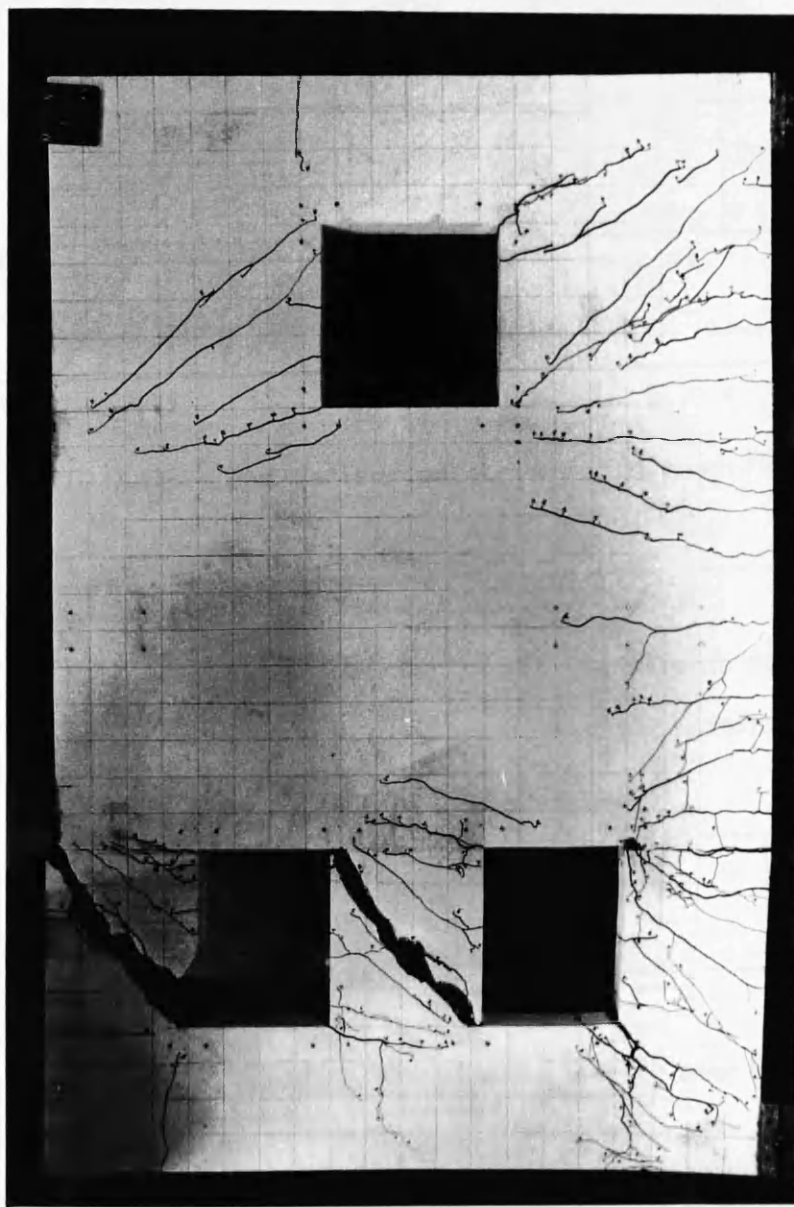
Failure mechanism of girder TRGRAS10
